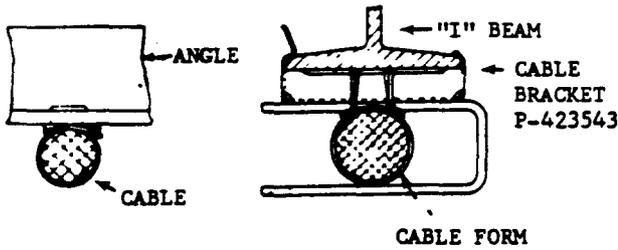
FASTENING CABLE FORMS TO CABLE BRACKETS OR BARS (PAR. 3.81)
